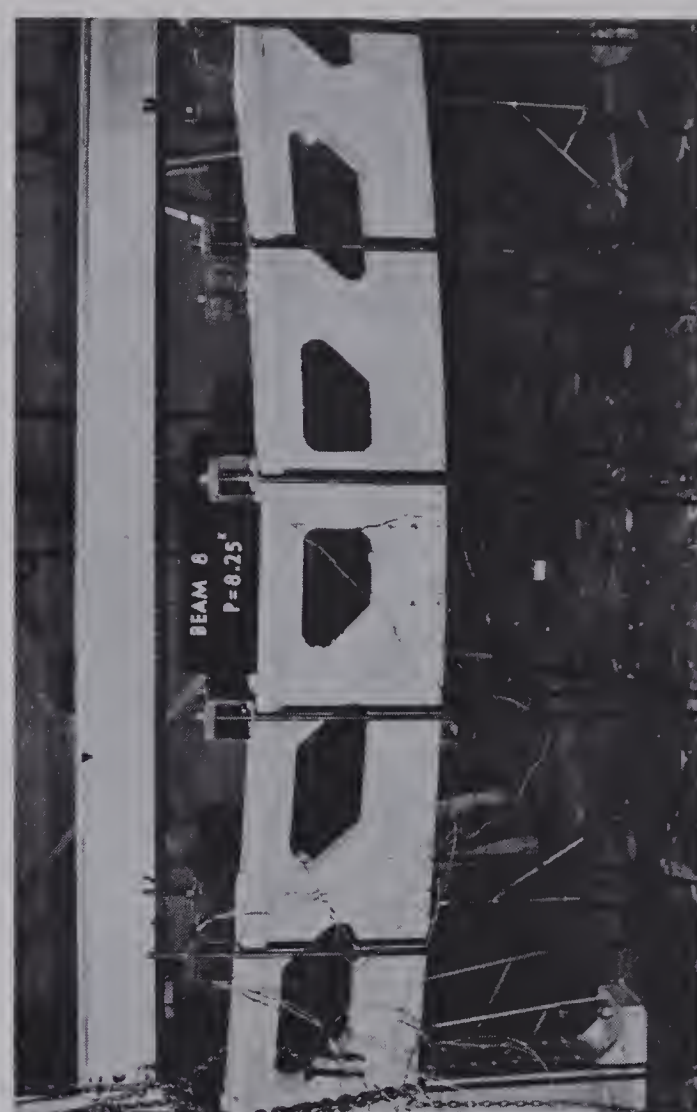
(f) CRACKING AND FAILURE PATTERNS, BEAM 6
